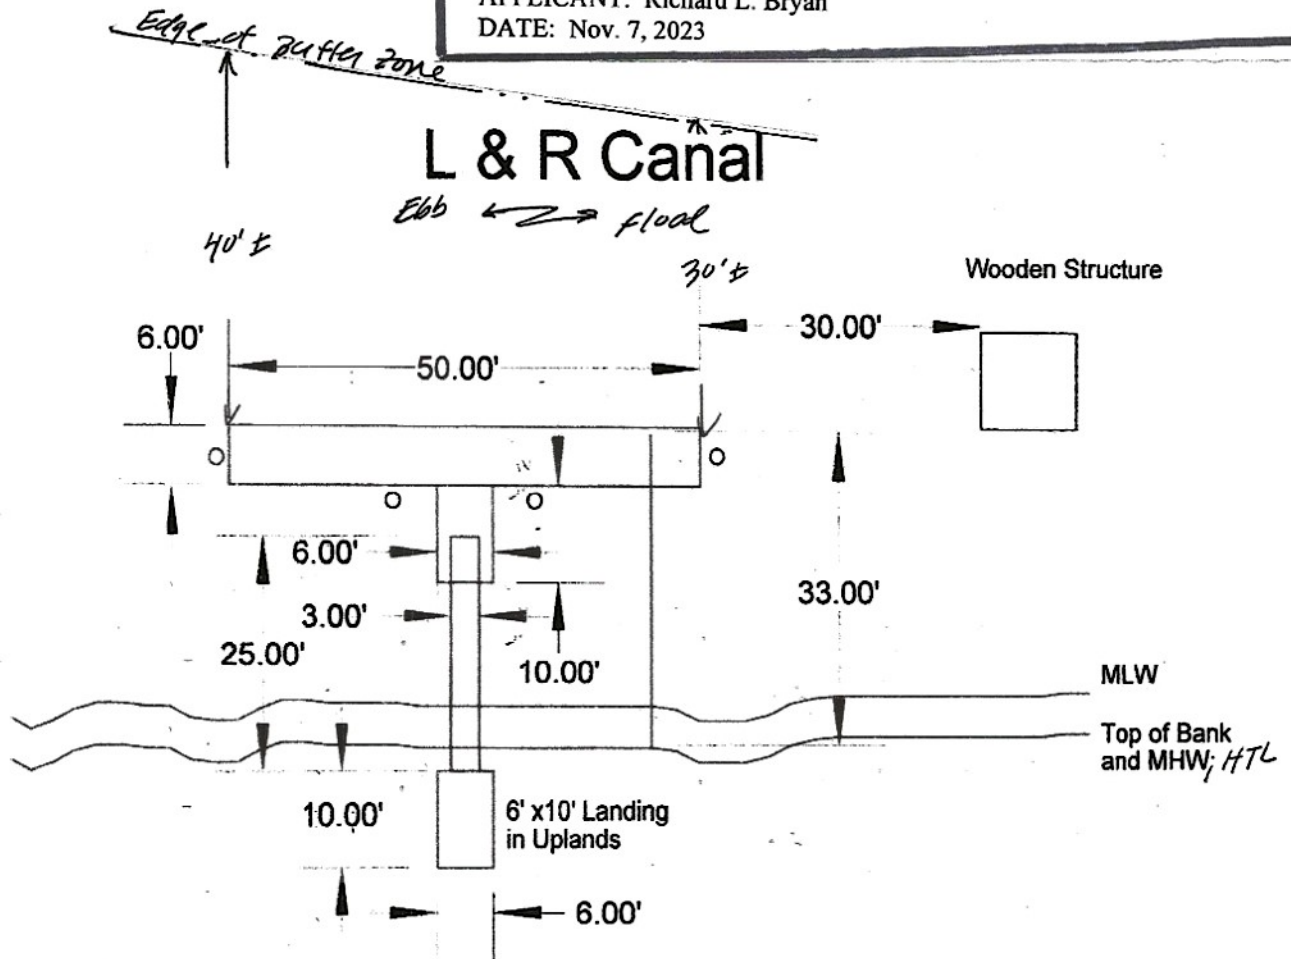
Plan view and cross-section of proposed project (prepared by Precision Marine Construction, Inc.)
